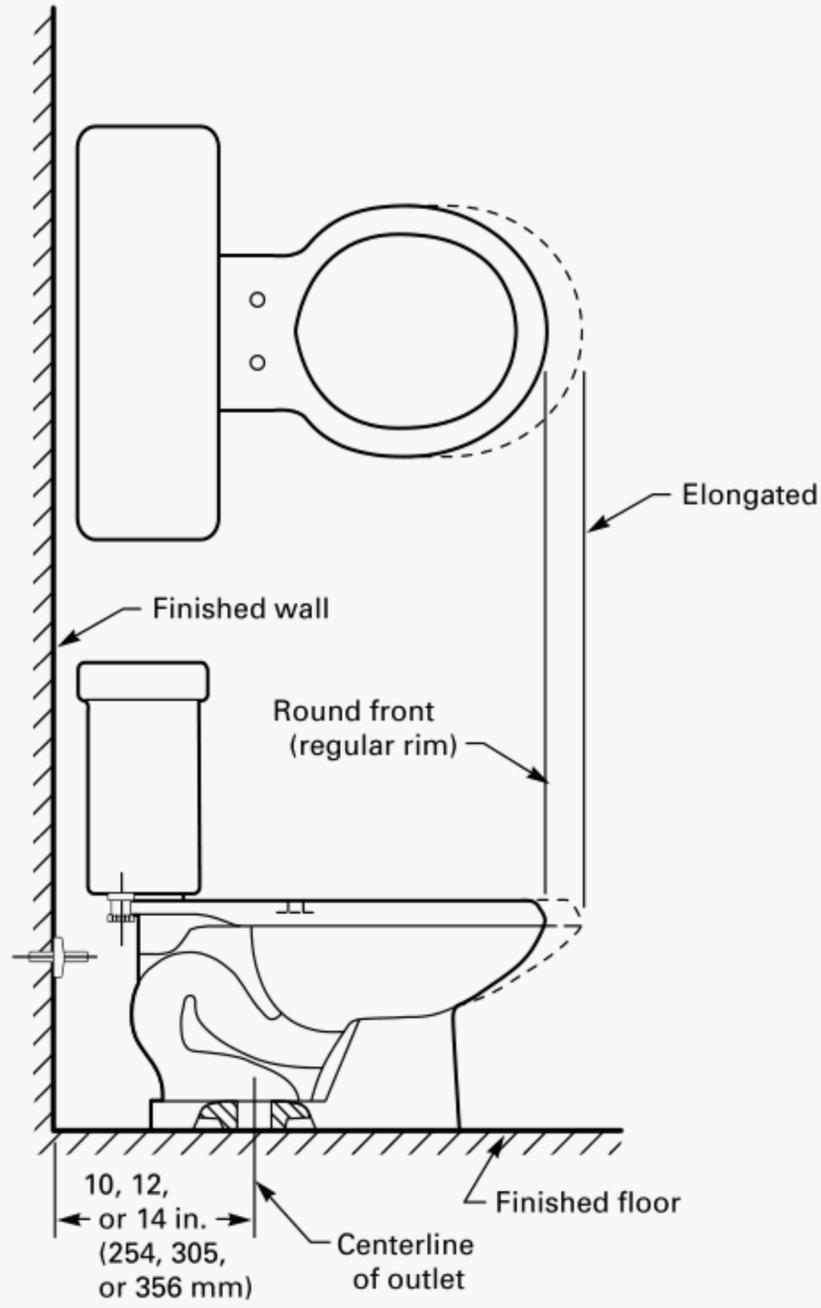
Close-Coupled Water Closet, Floor Mounted
